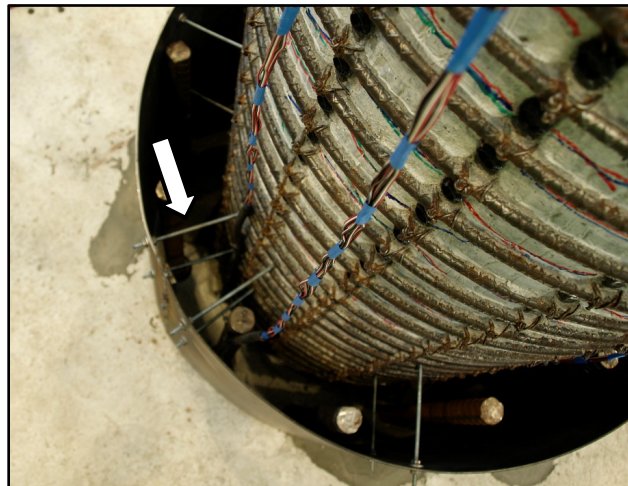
Steel sleeve with threaded rod spacers bearing against column
